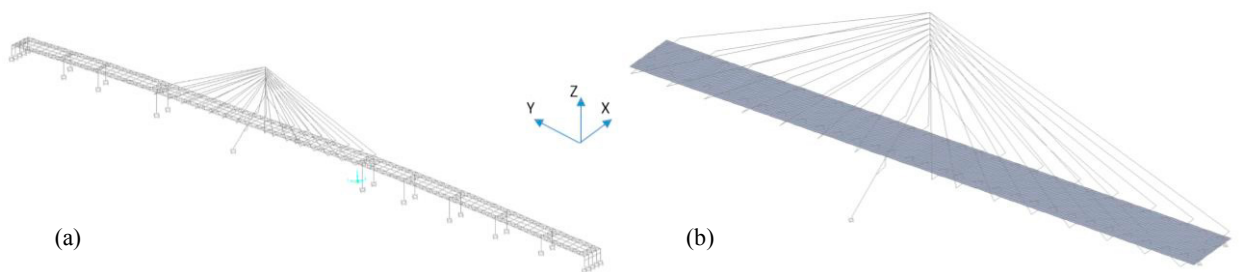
Structural numerical models: (a) full bridge model; (b) simplified model for cable-stayed span..
